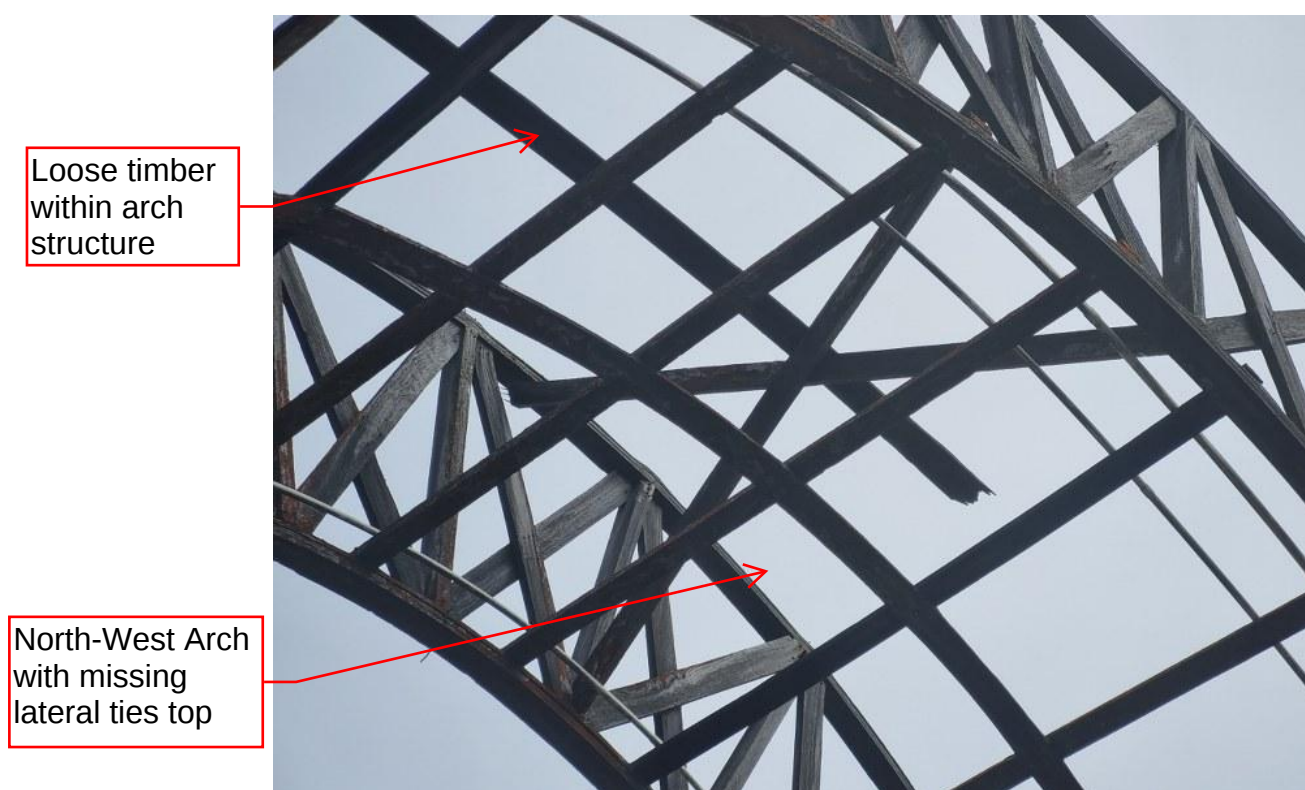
North-West Secondary Arch Span showing missing members to top chord, note timber laying within arch
